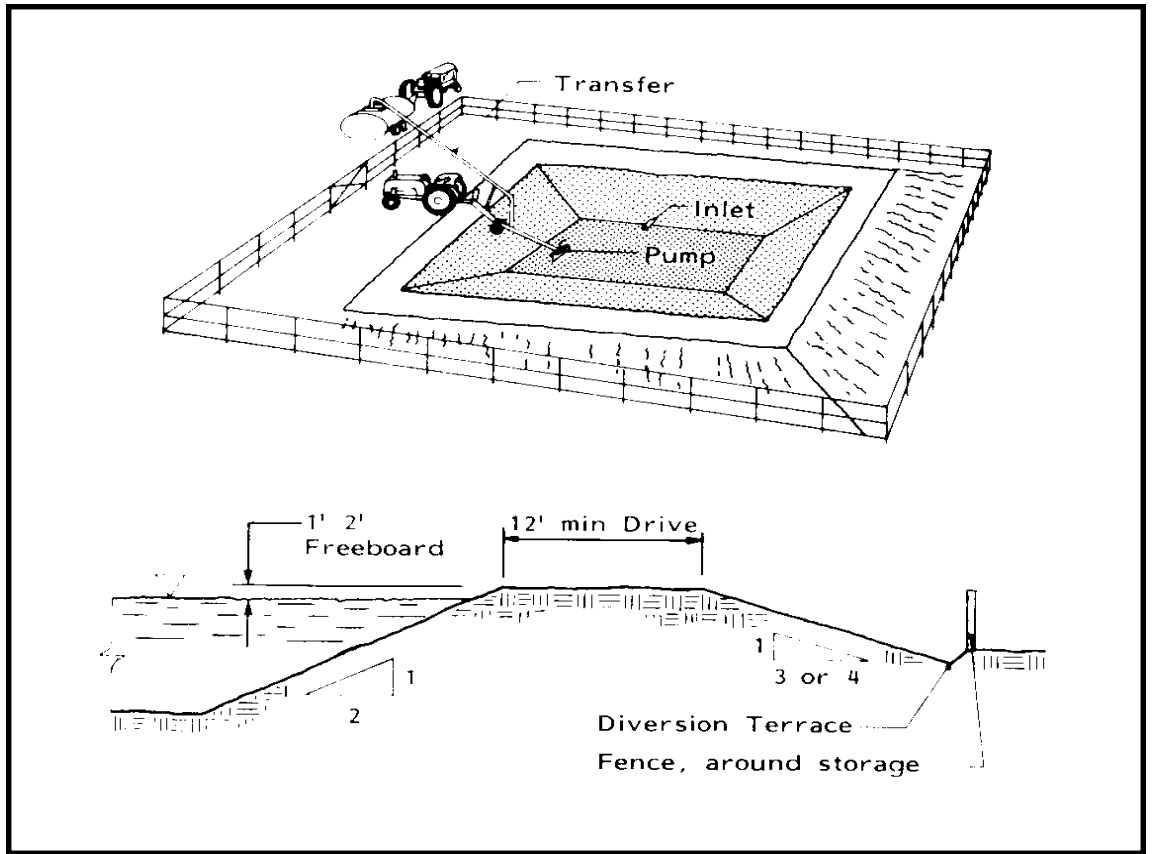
Earth basins for manure and dairy wastewater storage. Source: *Dairy and Equipment Housing Handbook, MWPS-7, Midwest Plan Service, Ames, Iowa.
